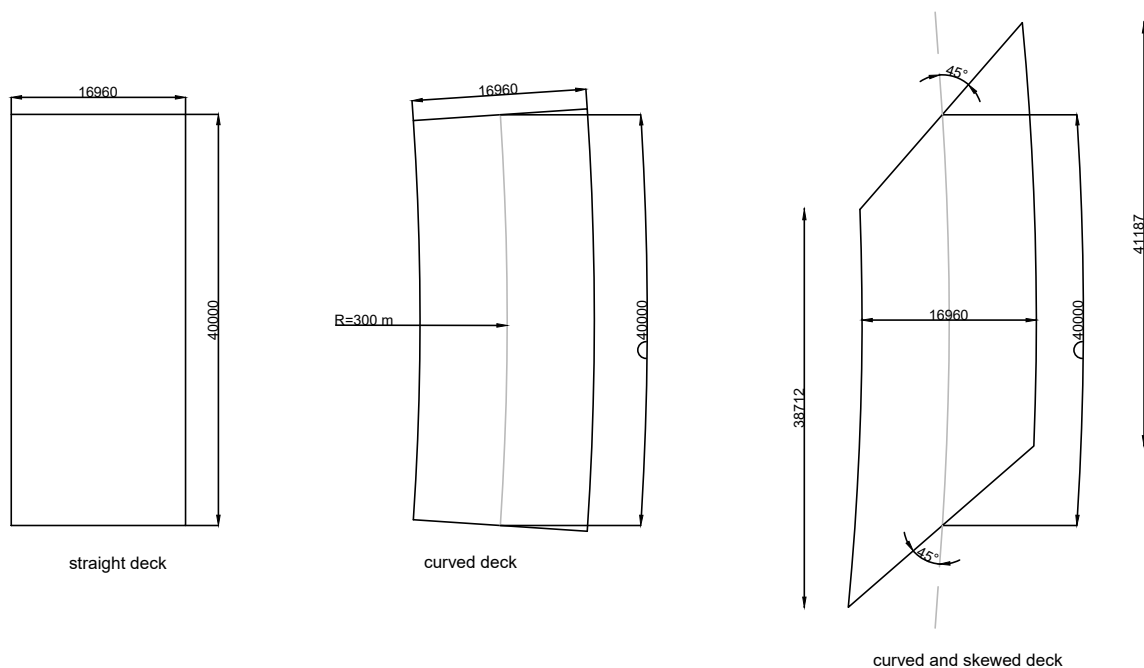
Layout of the bridge decks analysed (top view) (mm)
